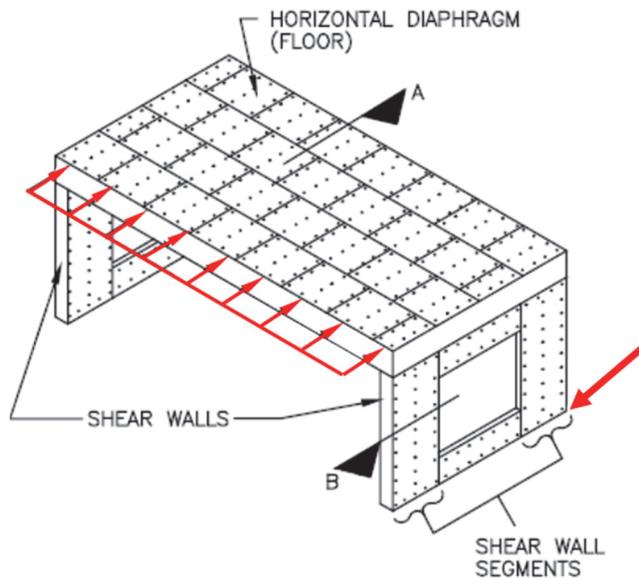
Schematic of the role of horizontal diaphragms (e.g., floors or roofs) as structural elements resisting earthquake forces, where the red arrows indicate the direction of forces (image credit: U.S. Department of Housing and Urban Development).
